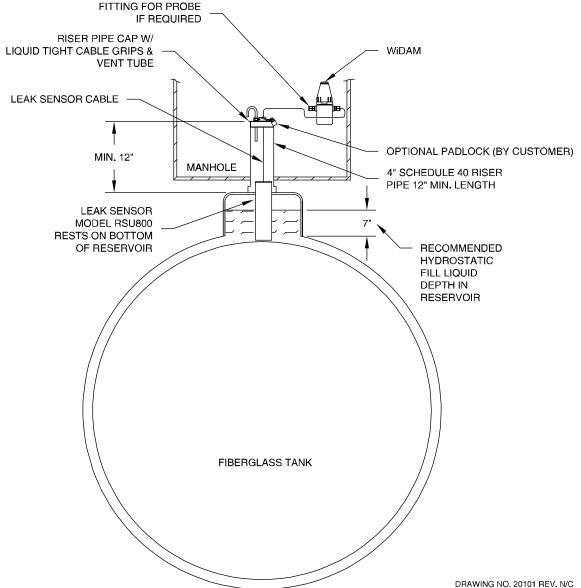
Hydrostatic Leak Sensor Installation in Fiberglass Tanks
